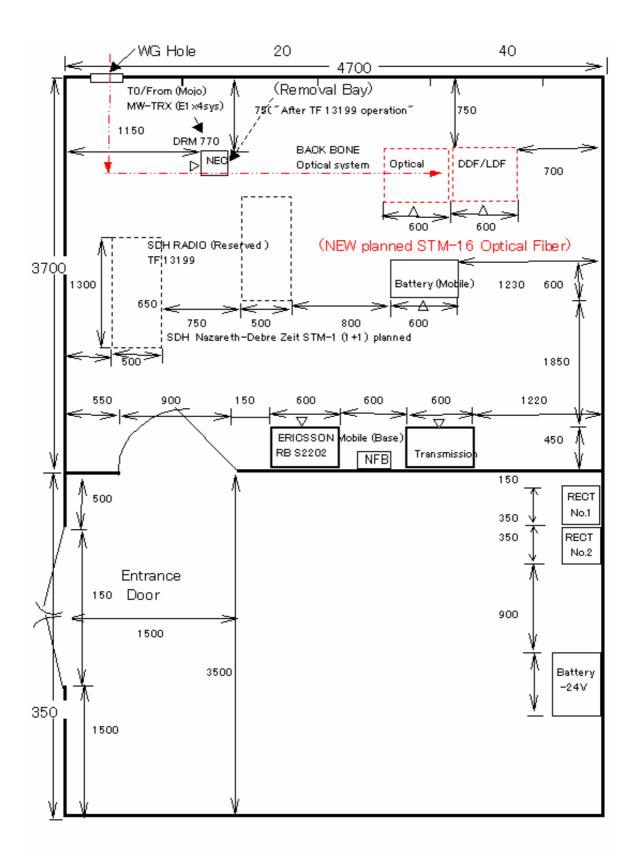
4 RADIO/MUX / POWER ROOM Planned Installation Place (Debre Zeit)
